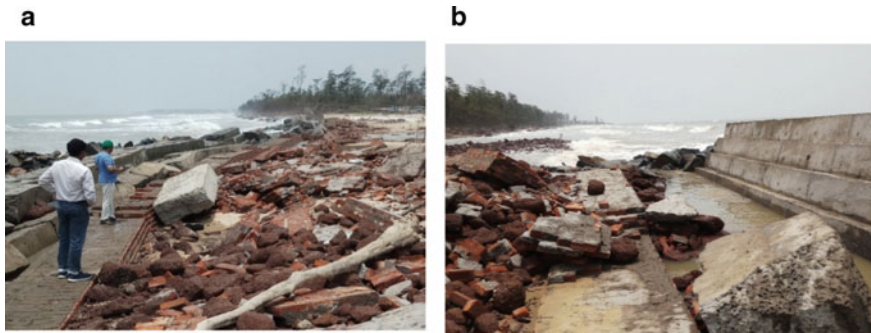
a and b: Damaged guard wall and masonry retaining wall at Nayak Ghat, Shankarpur (Harbour) as observed on 28.5.2021
